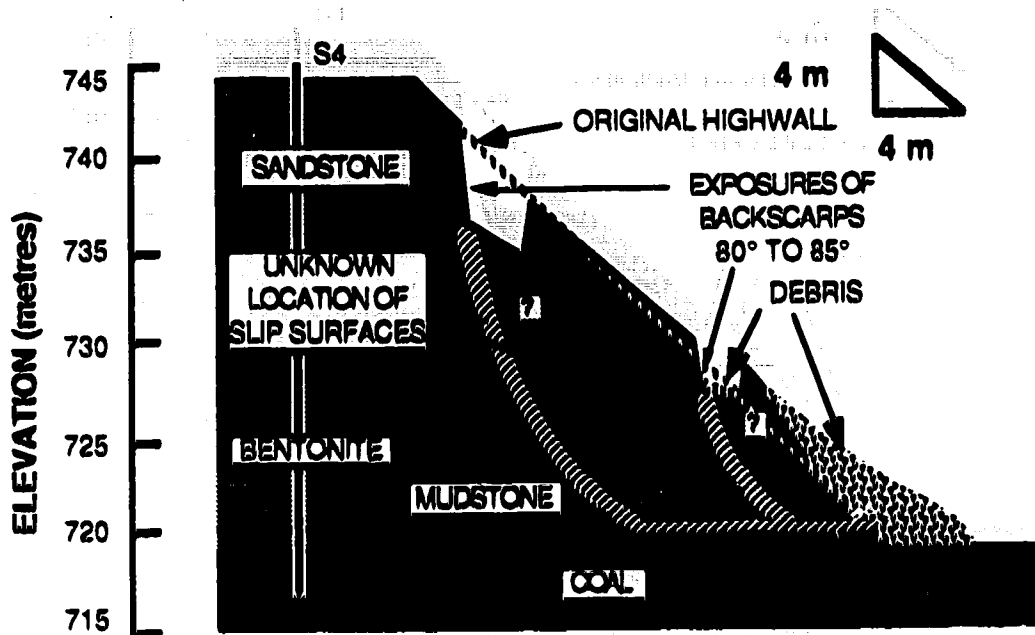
Post Failure Topography at Section A-A' through the west end of the failure, as observed on April 7, 1988.
